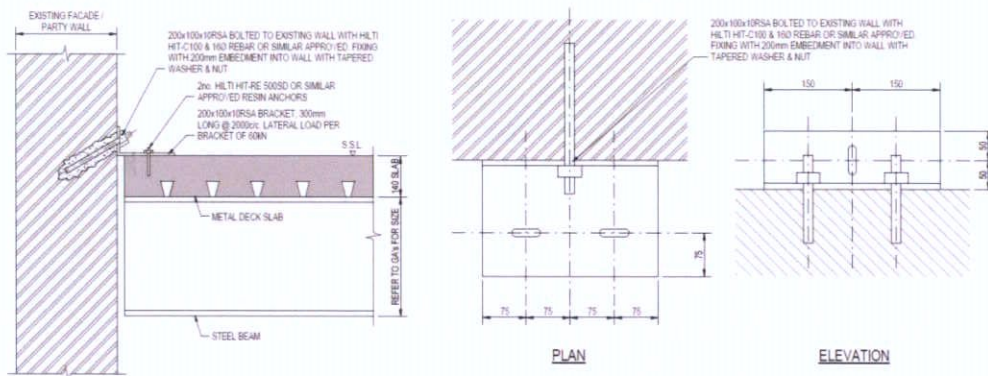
Typical Permanent Façade Restraint Fixing (Steel Frame)
